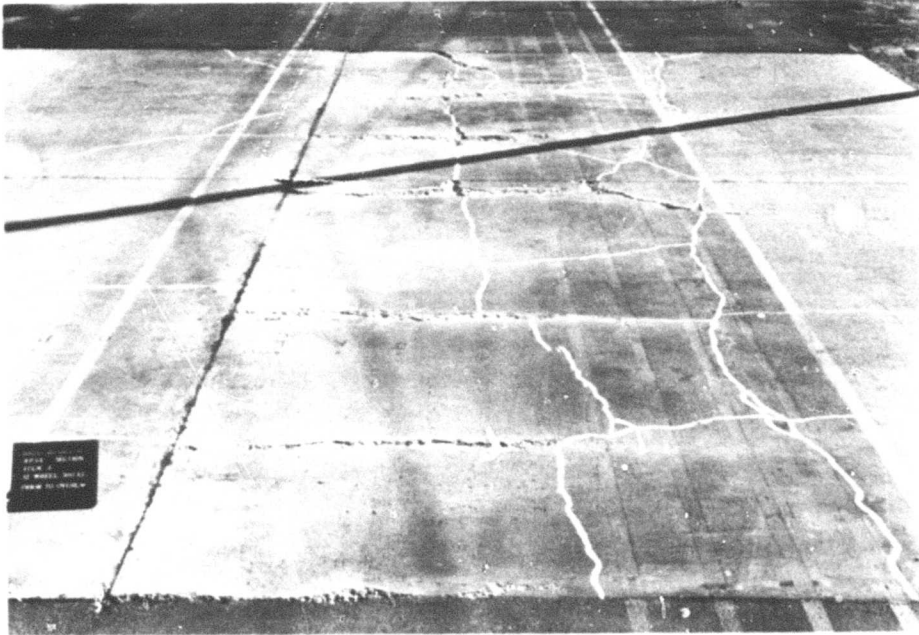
Condition of 10-in. Plain Concrete Test Item After 950 Traffic Loadings. Item has been cleaned and was overlaid at this point with a 4-in. fibrous concrete overlay
